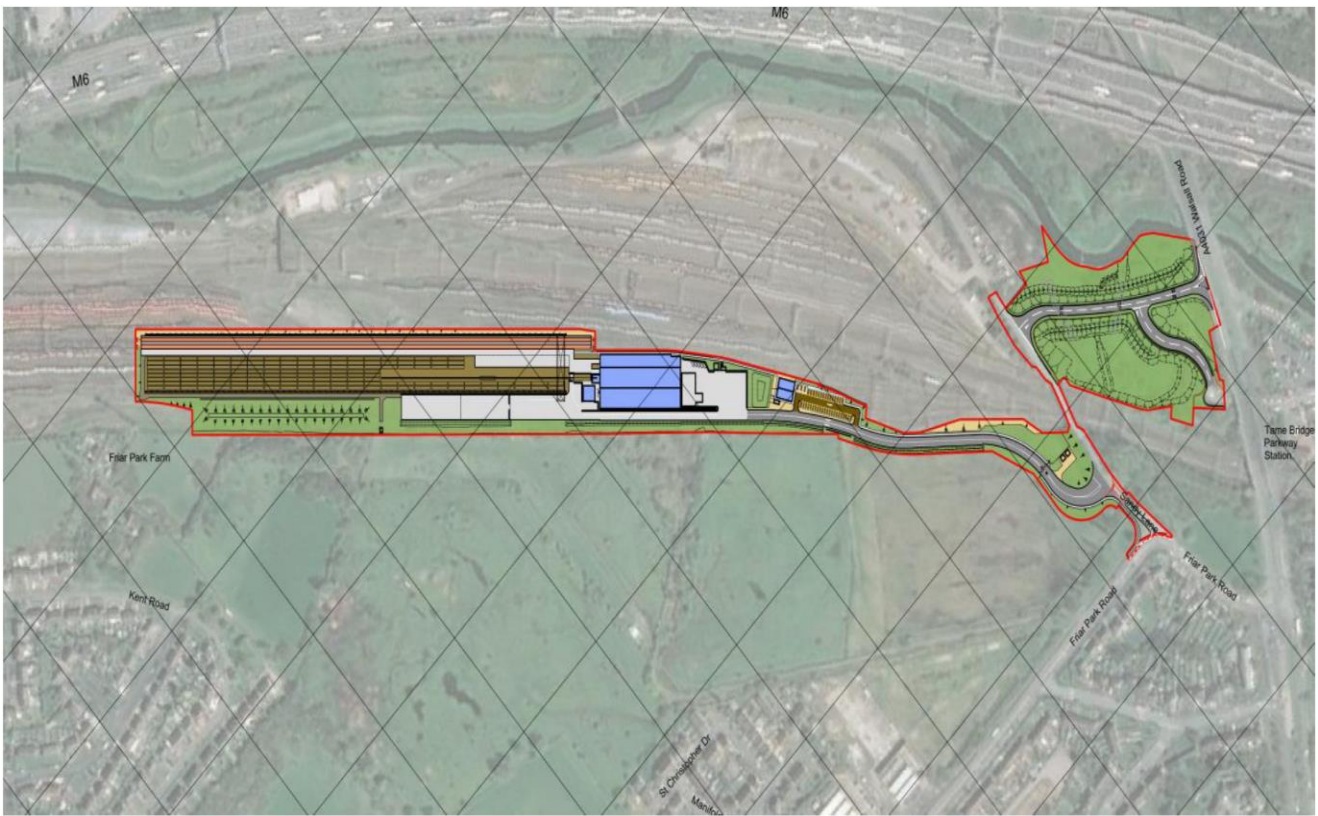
Proposed Development Masterplan (Source: RPS, 2019)
